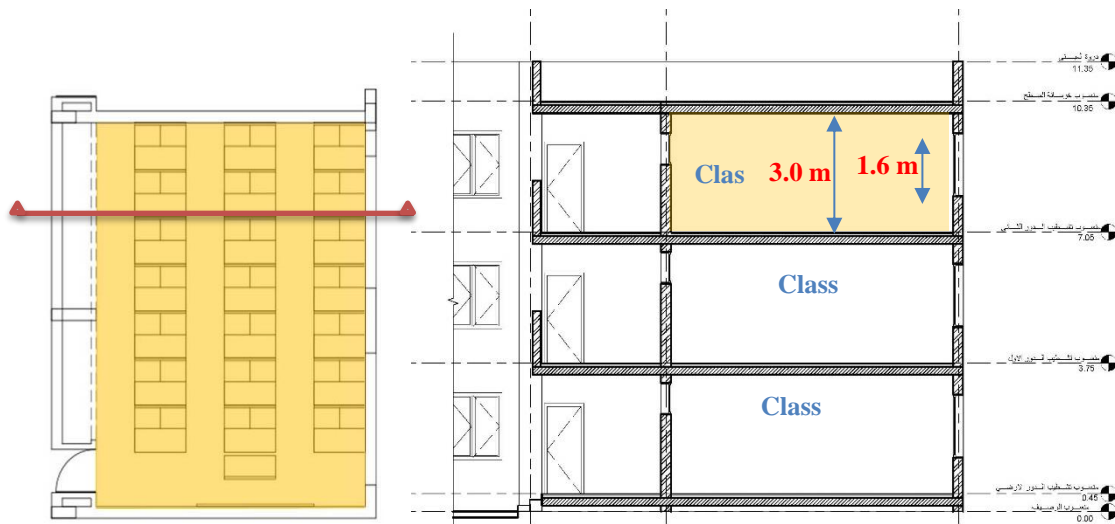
shows a vertical section and plan of one of the classrooms on the last floor Of the First District Girls Secondary School building in Sheikh Zayed.
